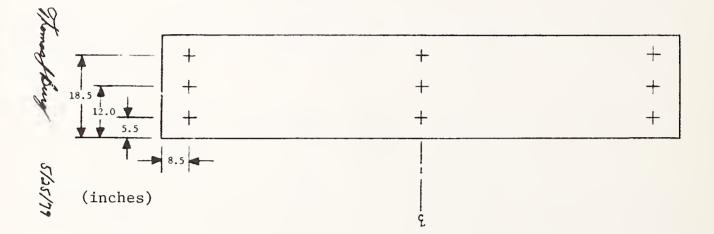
GUIDEWAY SURFACE THERMOCOUPLE LOCATION
